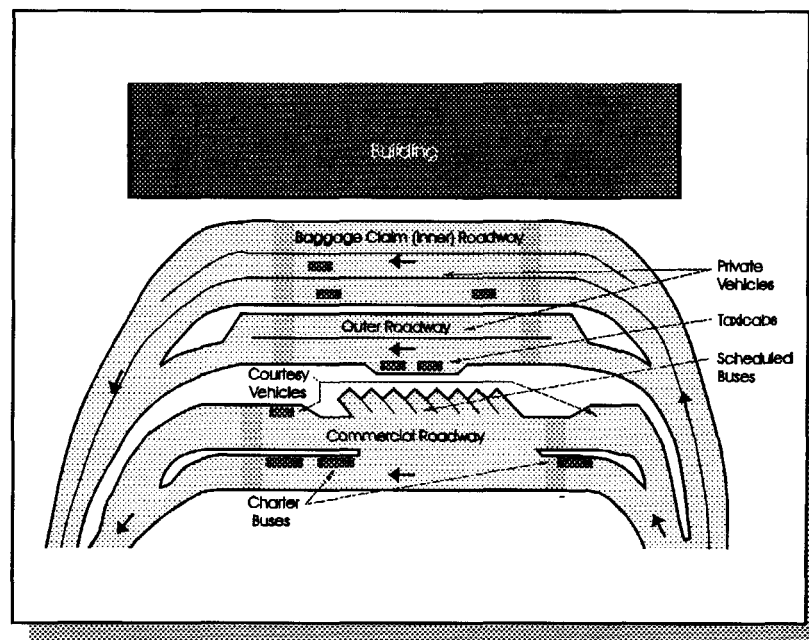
Horizontal Separation of Deplaning Curbside Roadways
